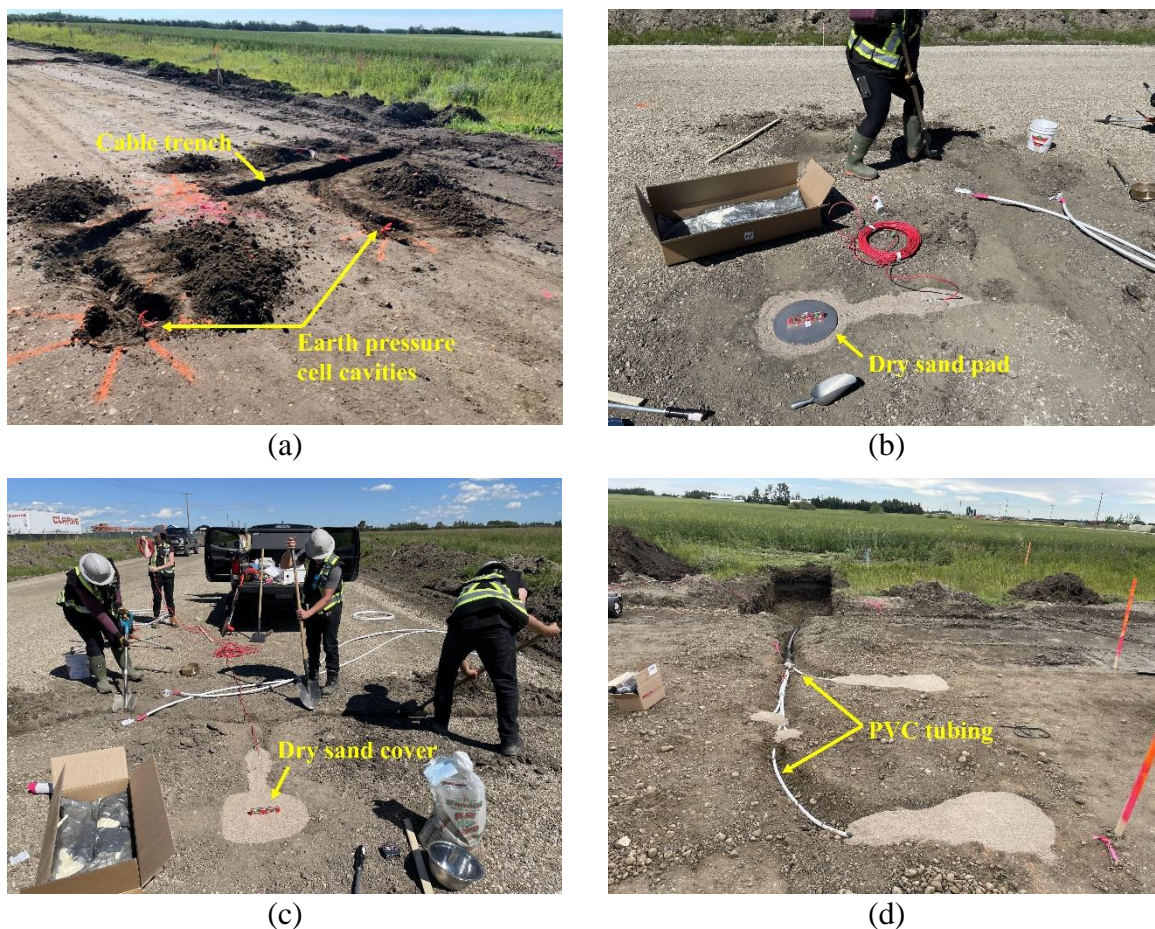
Installation of earth pressure cells: (a) creating cavities and trench, (b) placing sensors, (c) covering sensors with sand, and (d) adding cable protected by PVC
